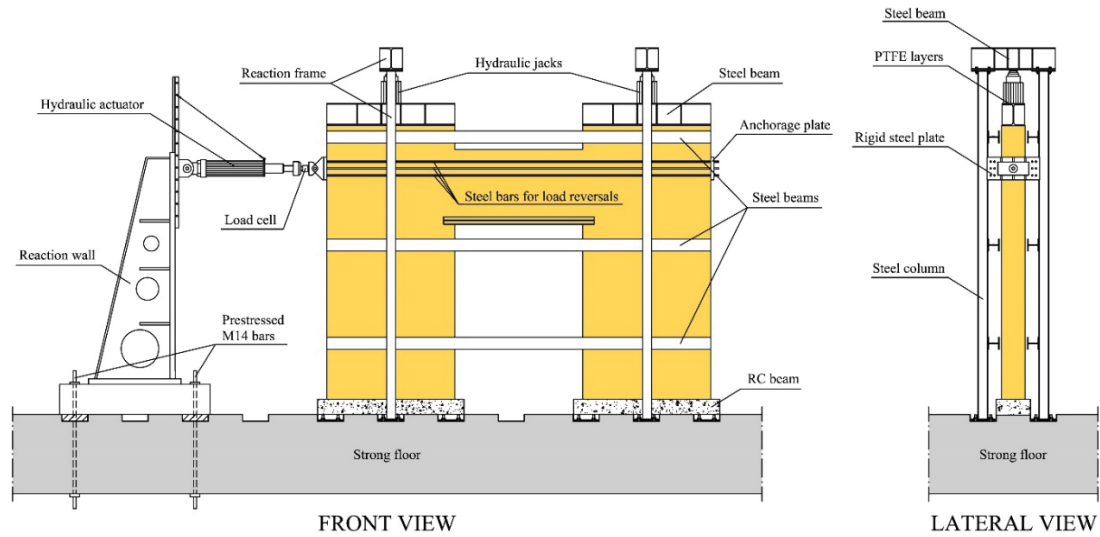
Experimental setup of lateral loading test on full-scale URM wall with opening [13].
